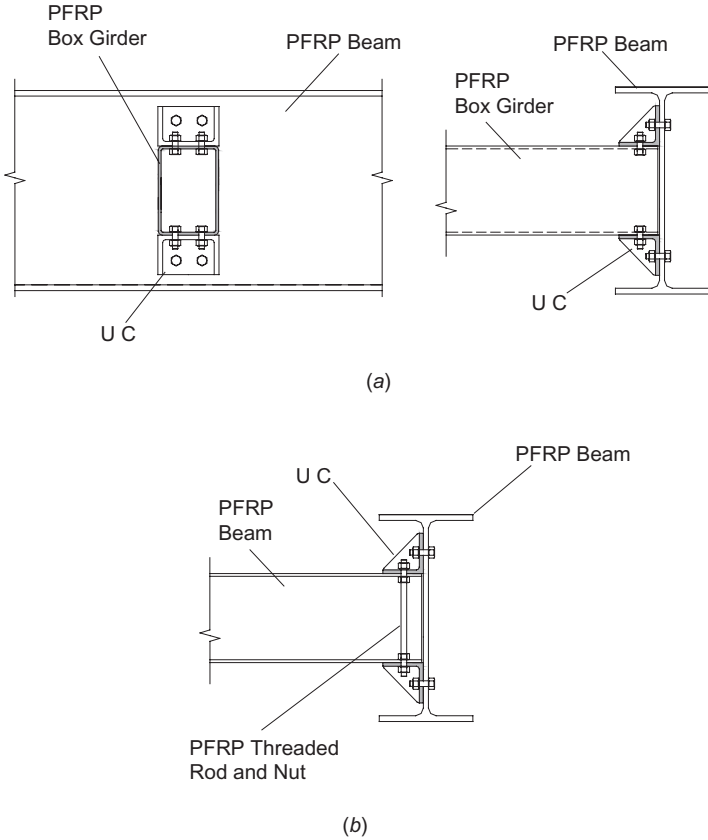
Rigid and semi-rigid PFRP beam-to-girder connection details.
